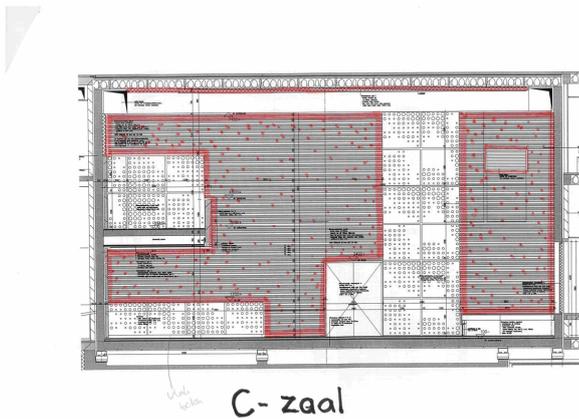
Wall elevation Stage C. The acoustic lining (top layer: wooden planks) is shown in red.
